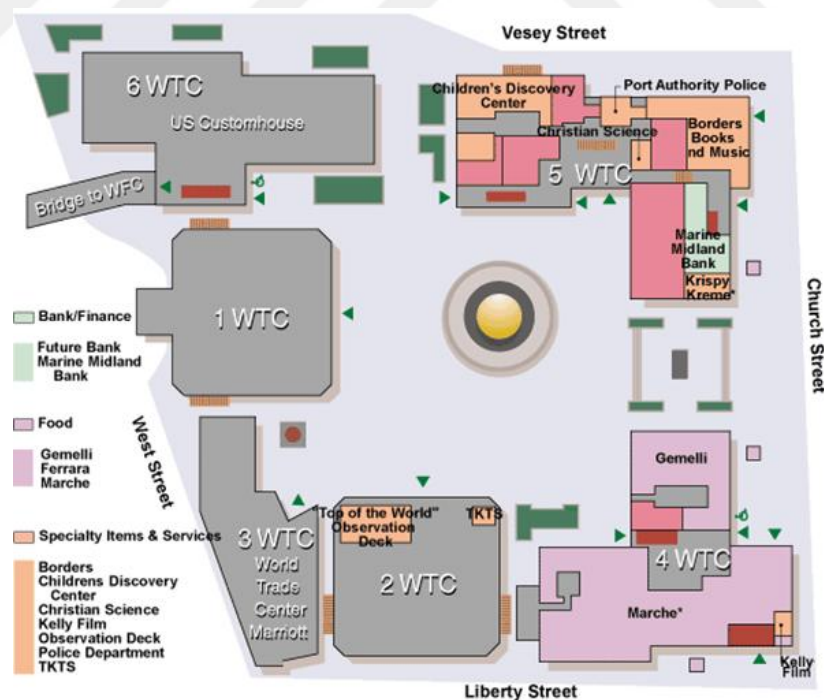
Site Plan of The World Trade Center Master Plan (Chin, 2005).
